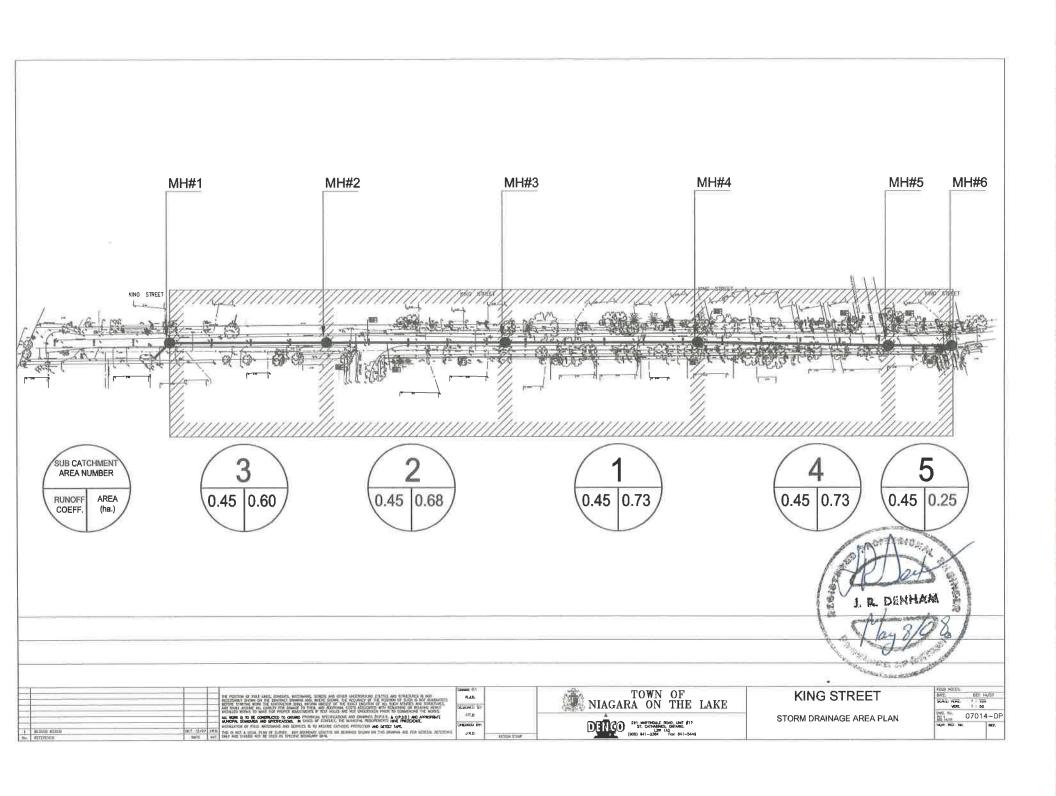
Proposed Storm Drainage Area Plan (5 Year Storm Event)
